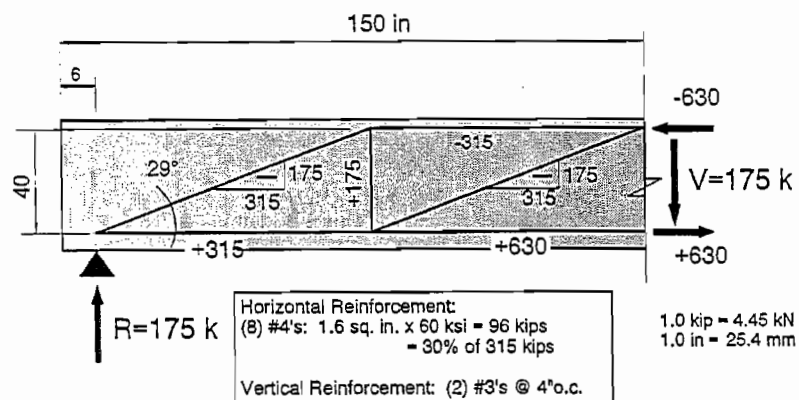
Truss Model of Shear Load at Flexural Ultimate Full-Sized Girder Tests
